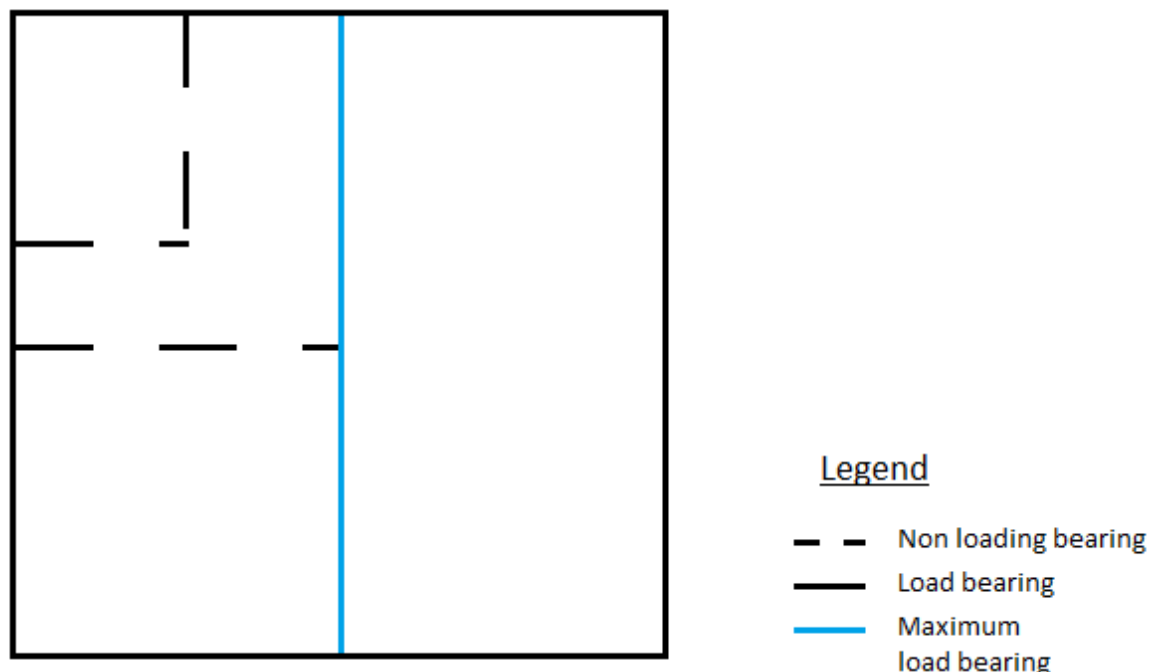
Layout of the wall system highlighting the function of each wall as well as the wall with the greatest applied load
